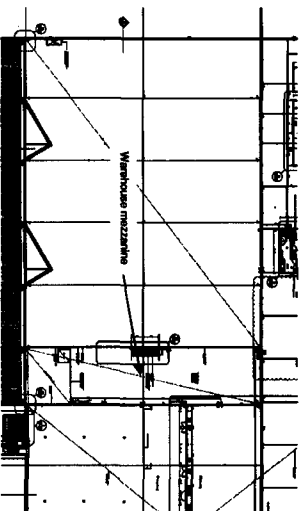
Open layout of warehouse mezzanine (Level 2)
